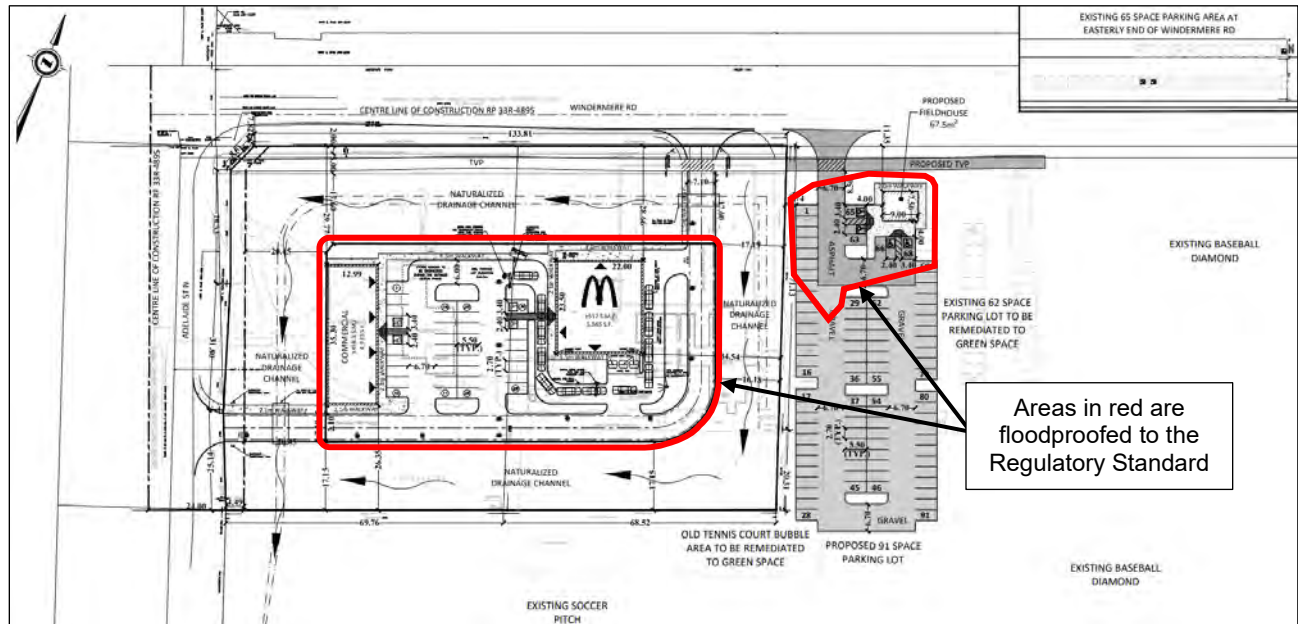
Proposed Site Plan for 1310 Adelaide Street North (SBM, October 2022)
